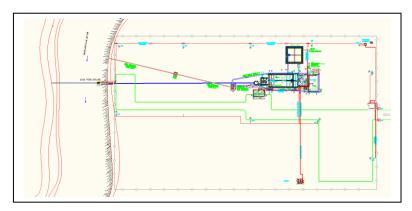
Location Plan of Proposed Sethamouak Water Treatment Plan
